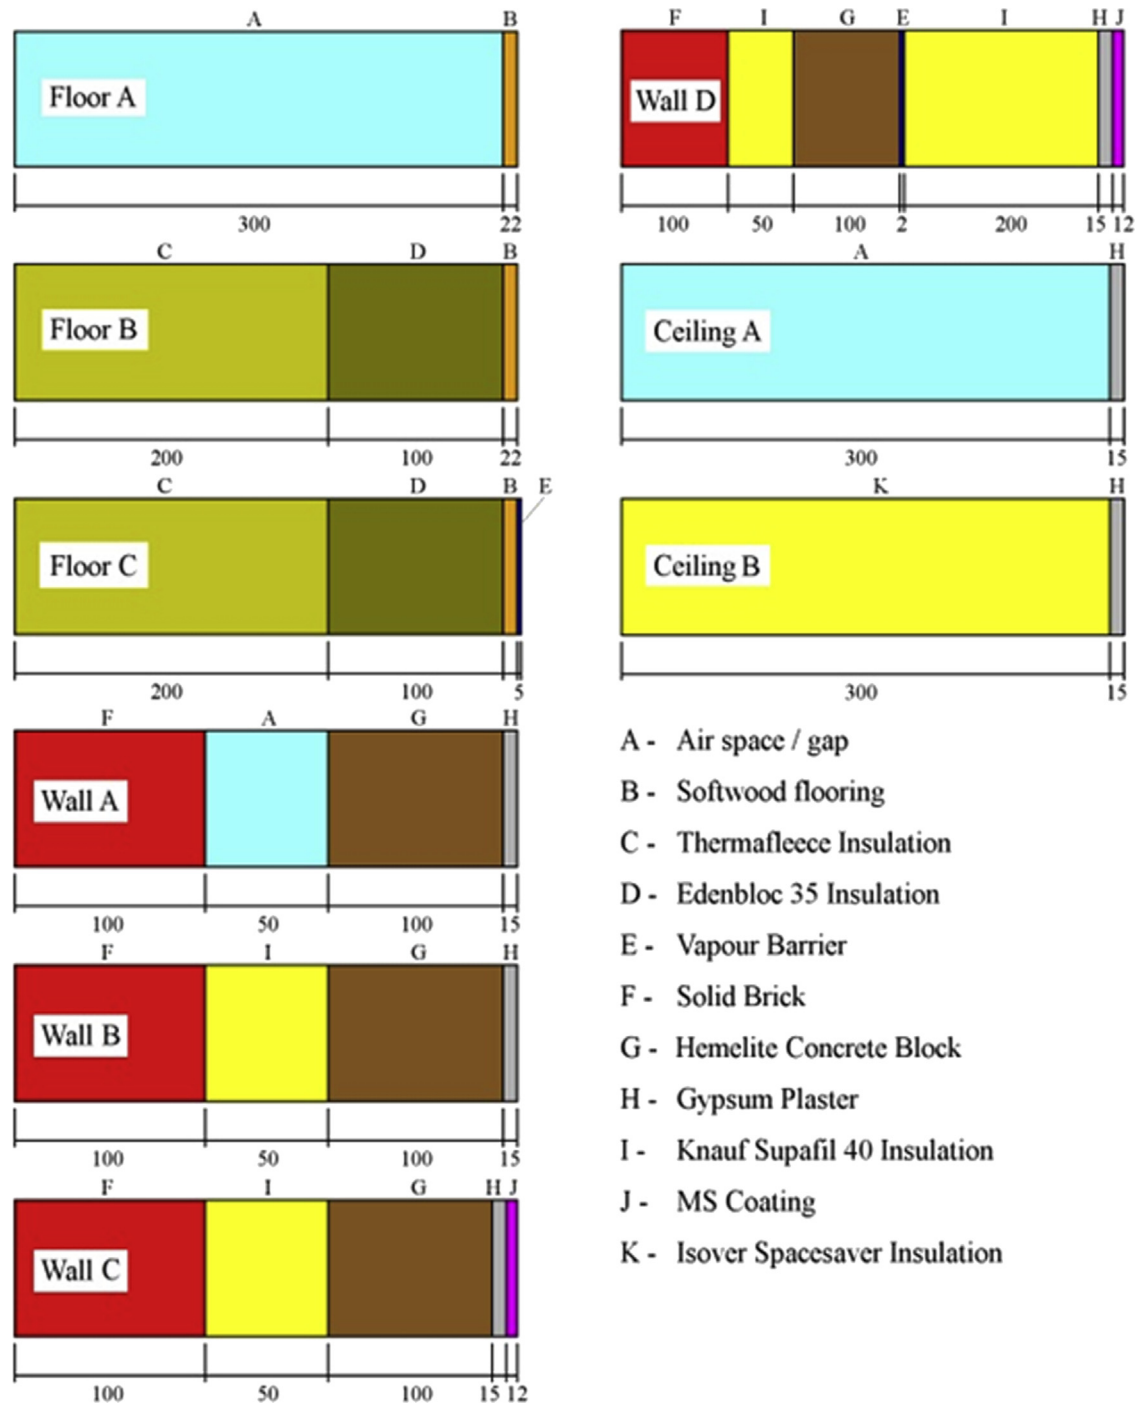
Cross-sectional assemblies of wall, floor and ceiling elements.
